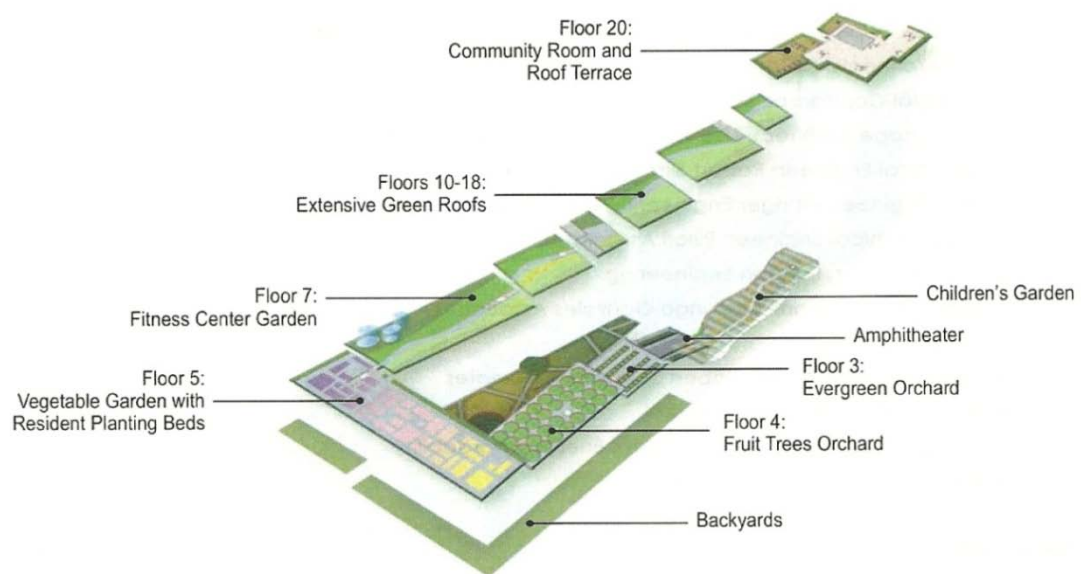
Via Verde's terraced landscape plan including the green roof garden (Source: Phipps Houses, 2011).
